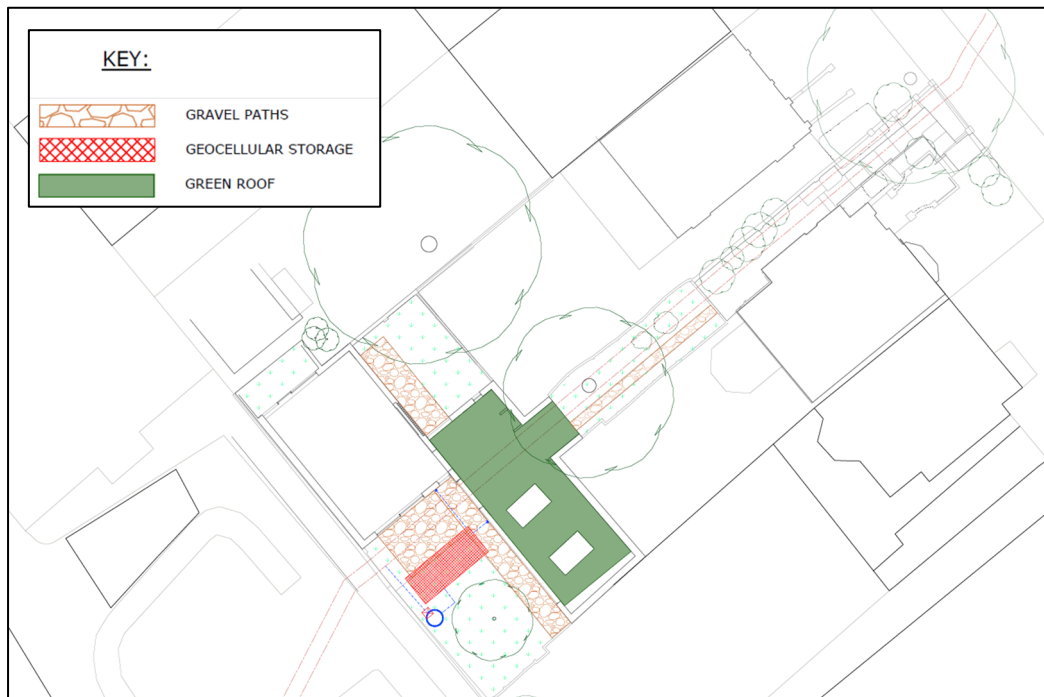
Indicative drainage layout plan showing the proposed location of SuDS.
